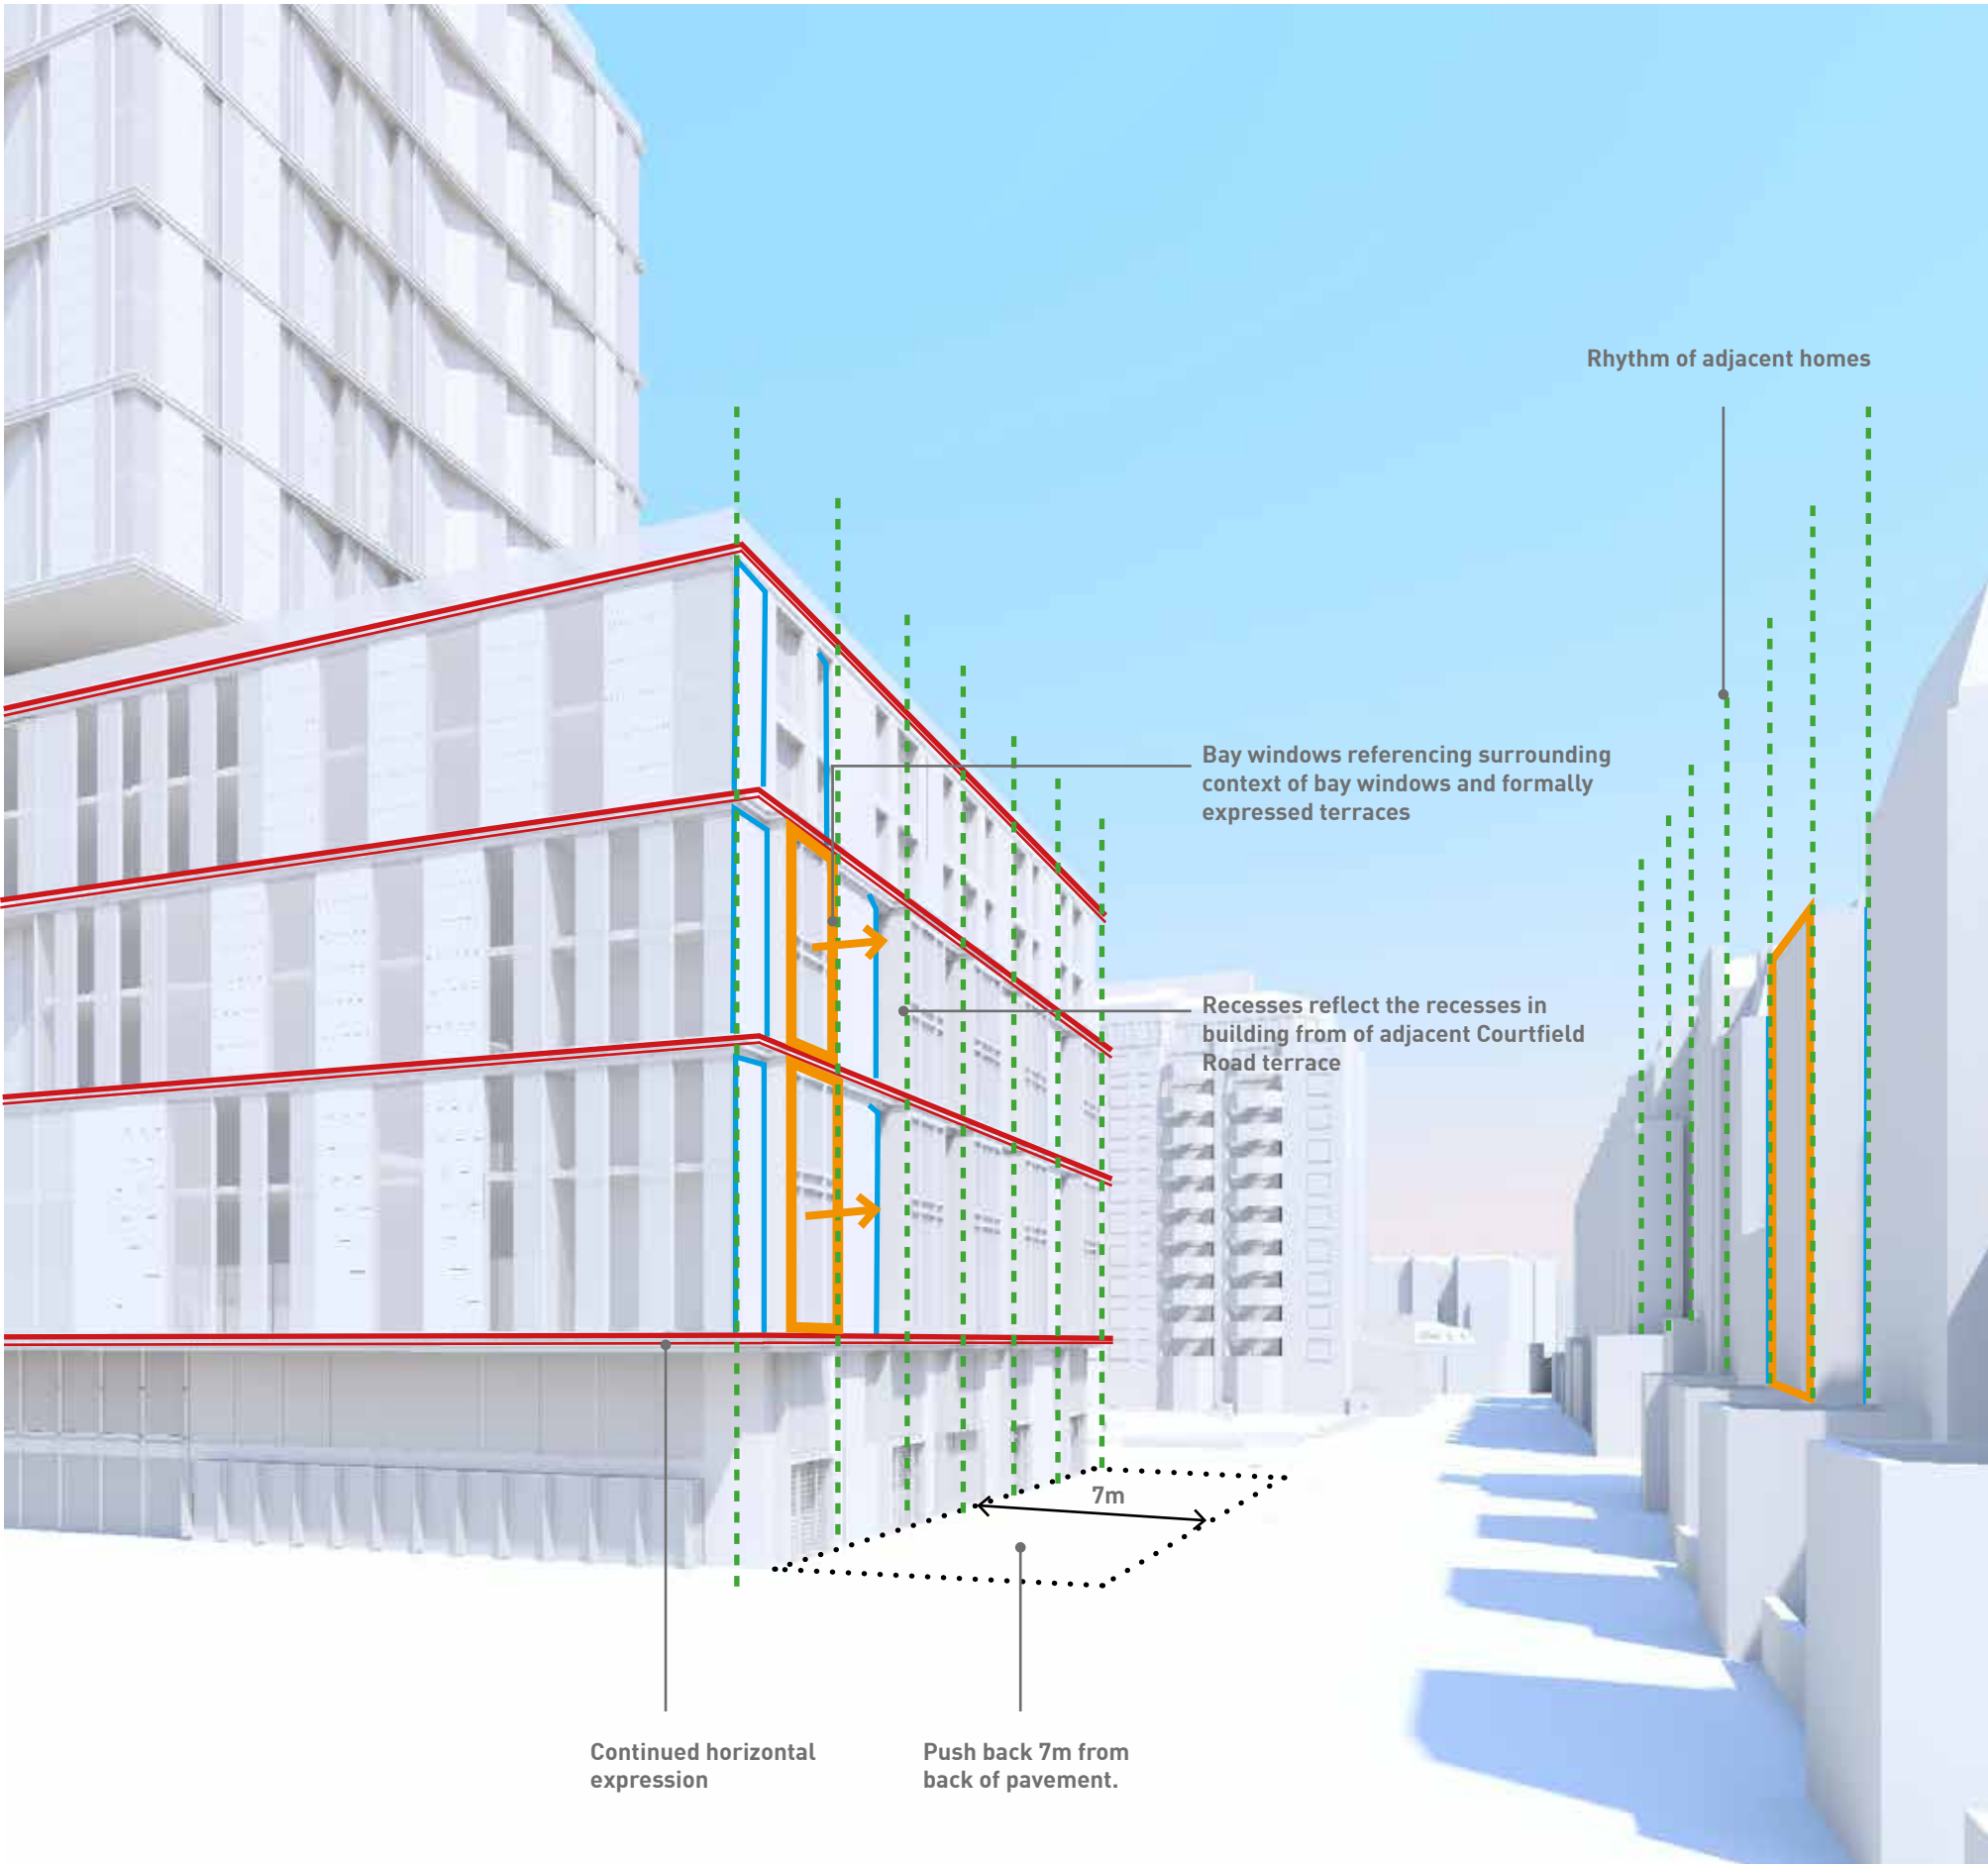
88 Concept diagram explaining the key elements of the facade strategy for the Courtfield Road elevation
